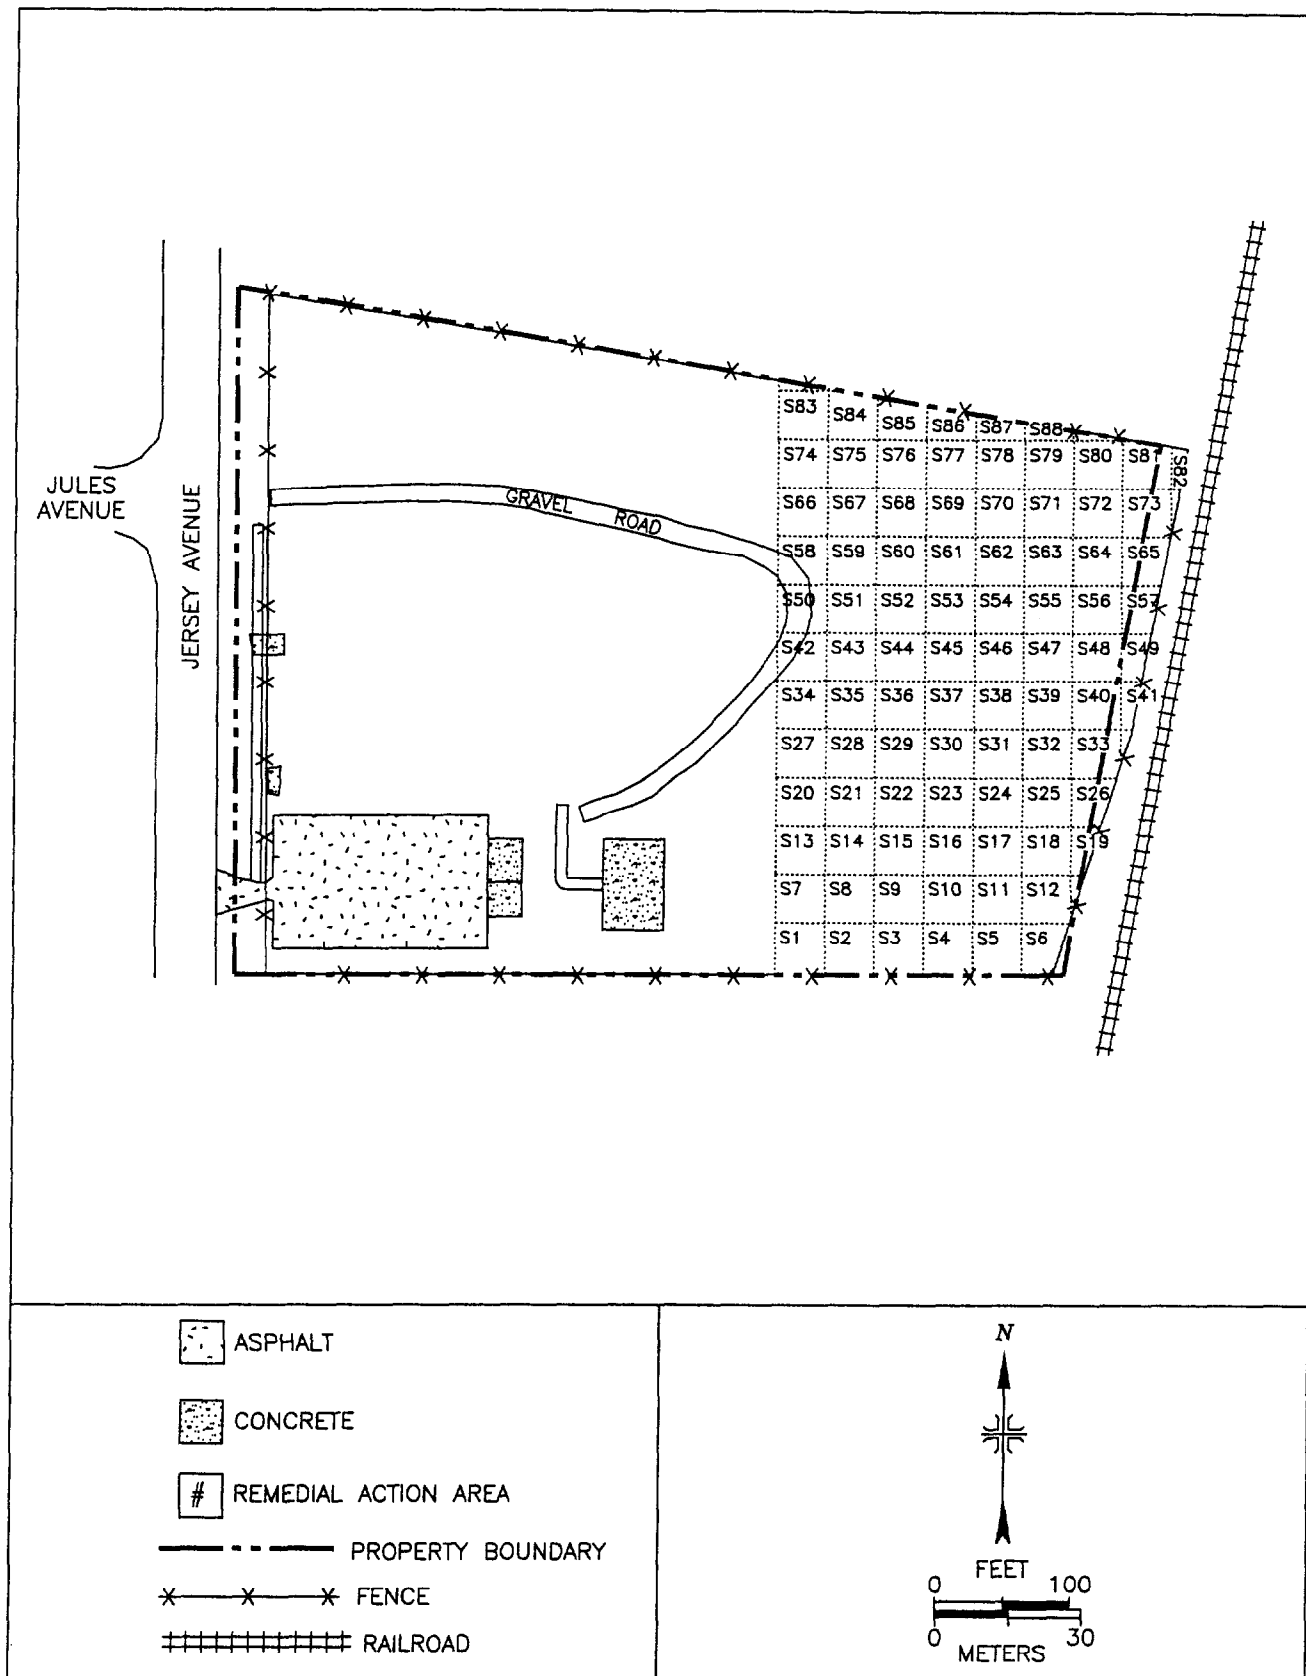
New Brunswick Laboratory Site -- Site Plan and Remedial Action Grid Blocks
